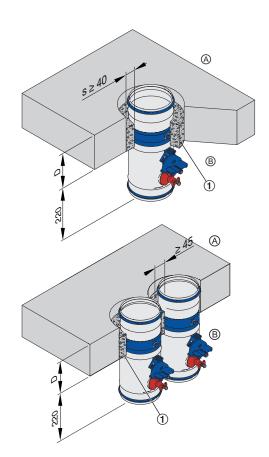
Mortar-based installation into solid ceiling slab, suspended or upright
